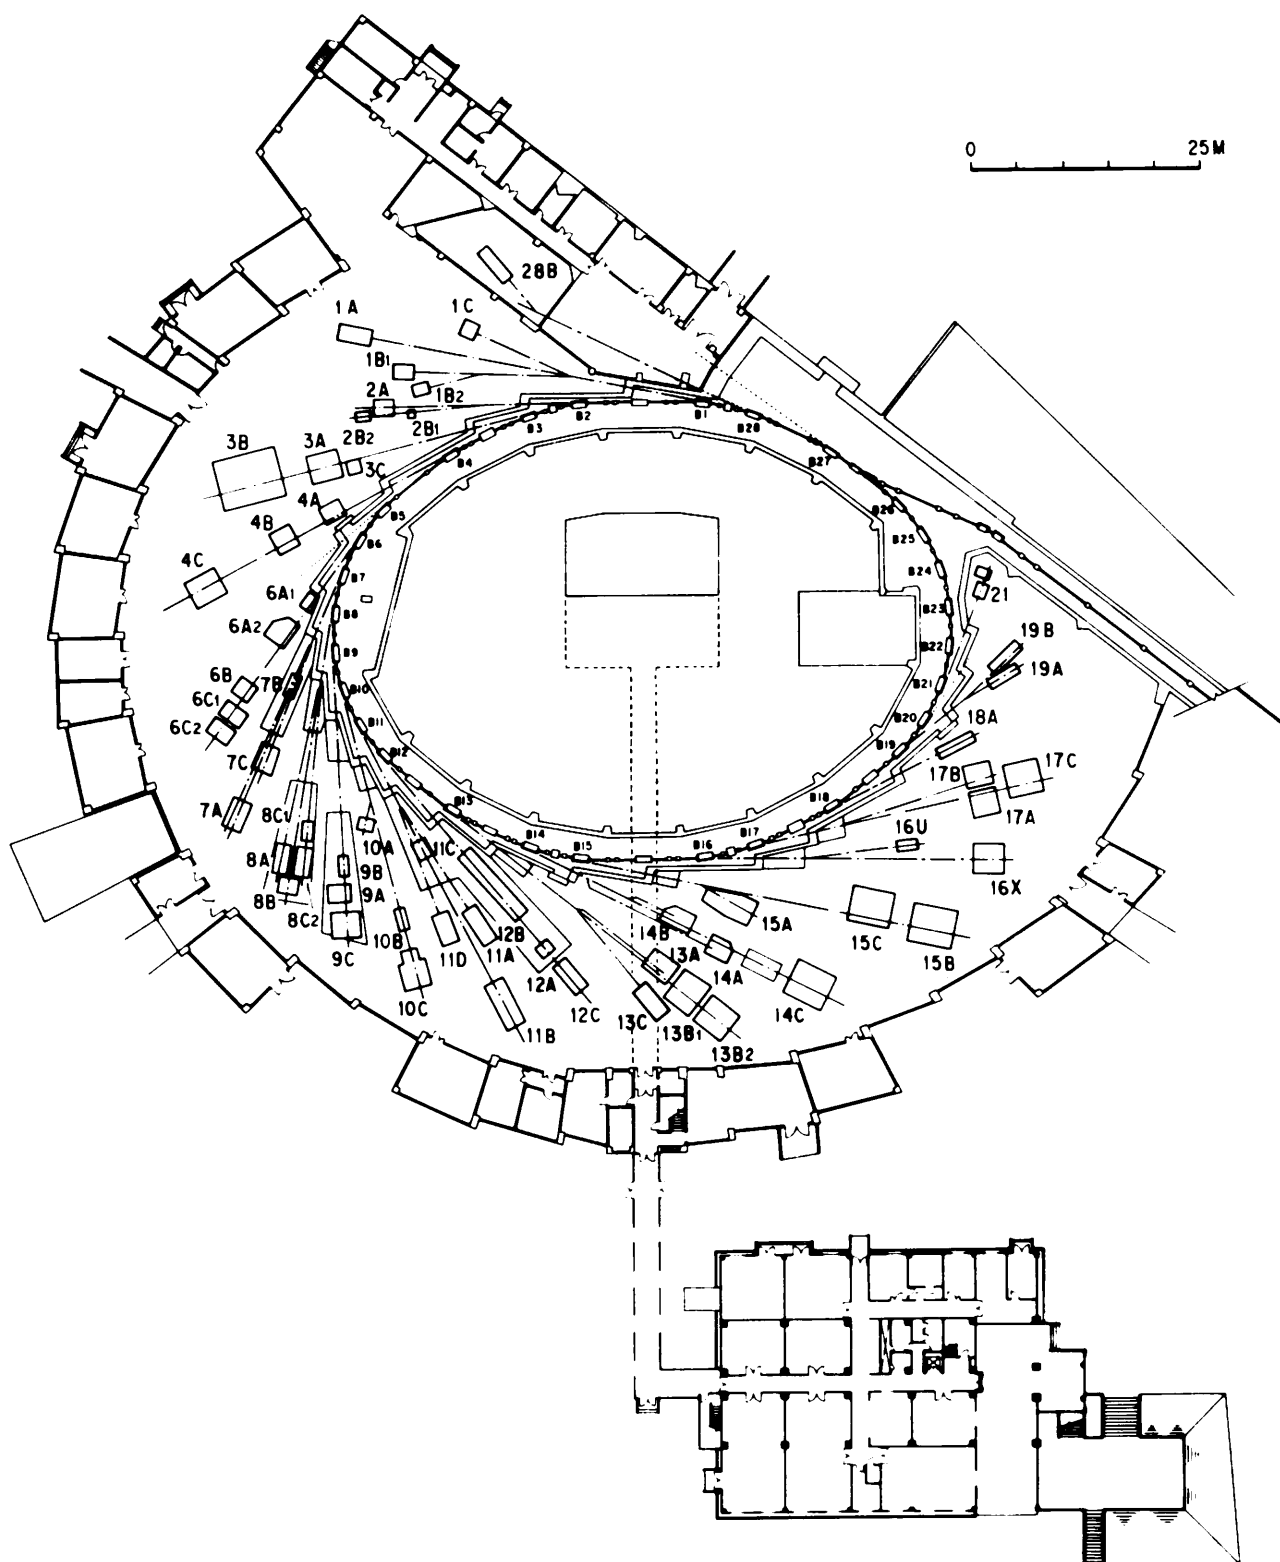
Plan view of the Photon Factory Experimental Hall.
